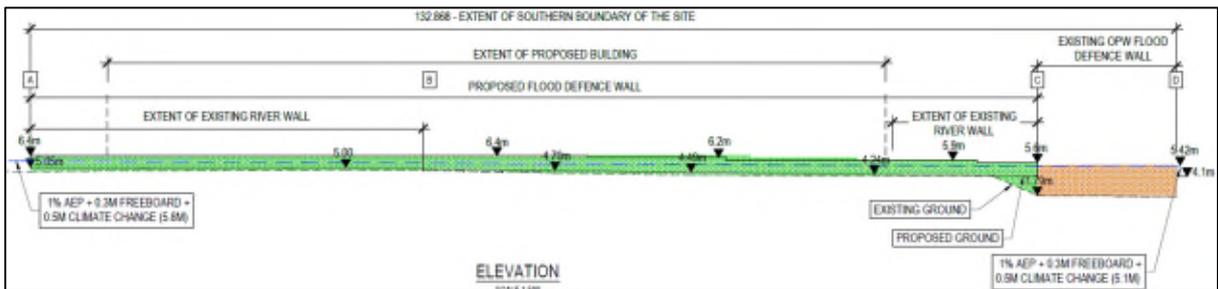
Proposed New Flood Wall within Site (shown green) (extract from Drawing 210027-DBFL-XX-SP-DR-C-1020)
